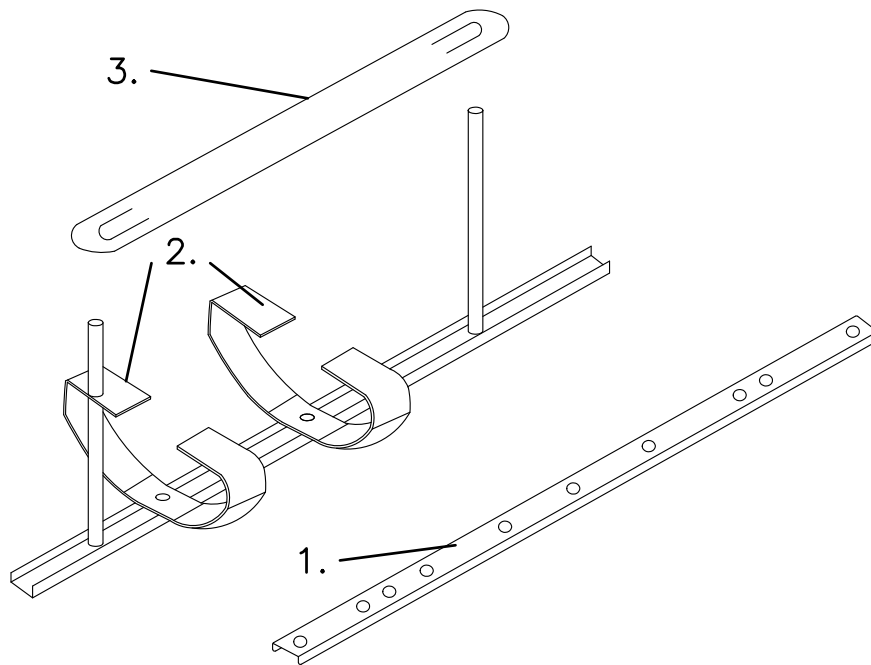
LOOSE BUFFER TUBE STORAGE
